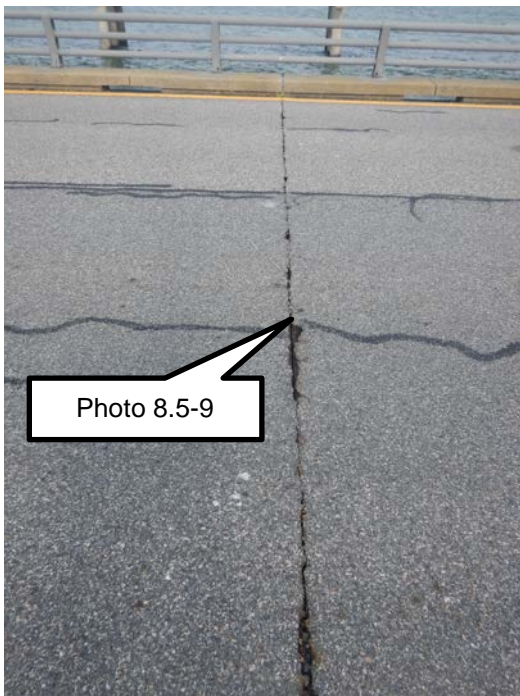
CNB159 Open Expansion Joint that has been Paved over Exhibiting Reflective Cracking (Looking West)
